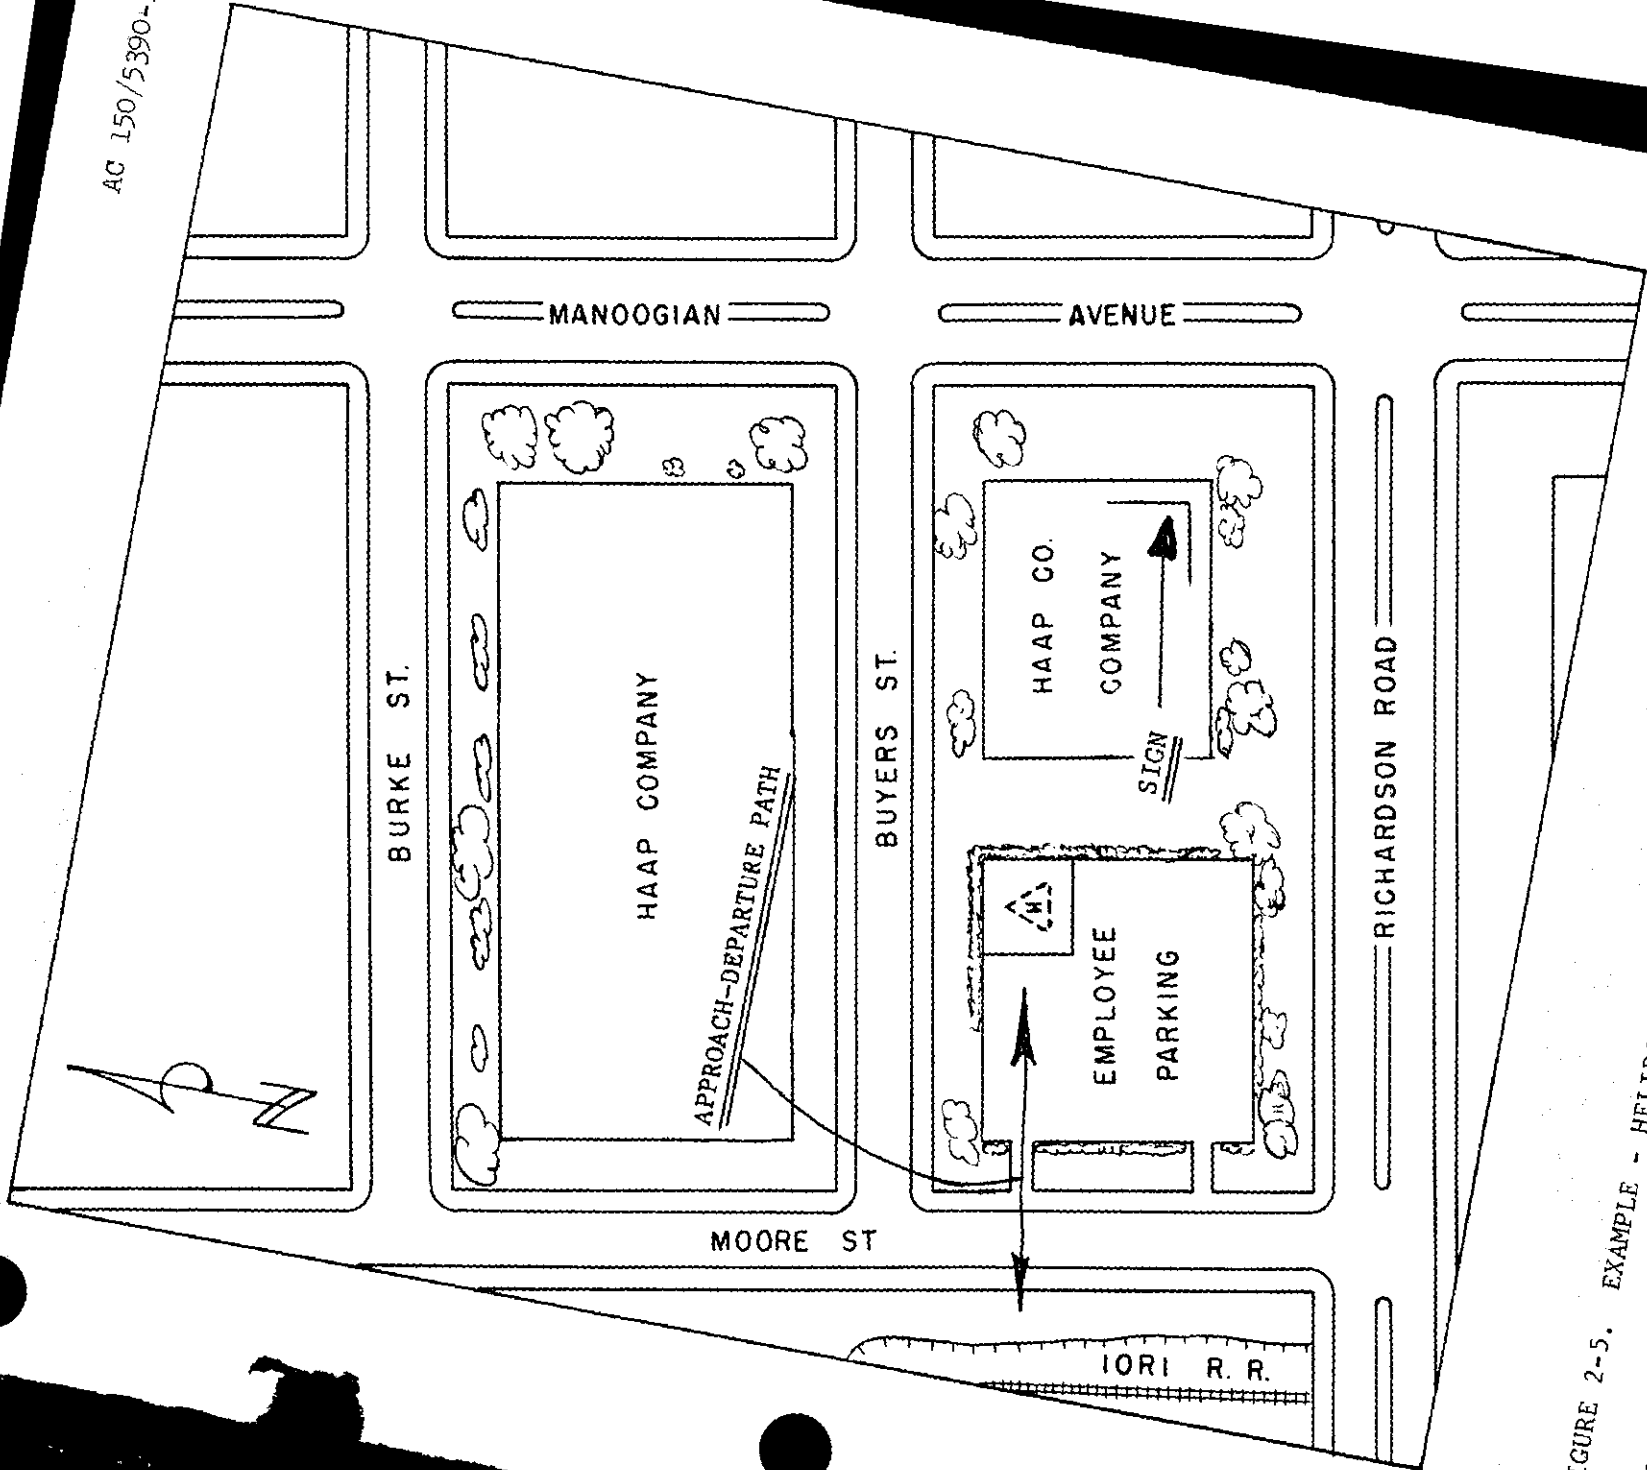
EXAMPLE - HELIPORT SKETCH SHOWING PROPOSED CONSTRUCTION LOCATION
